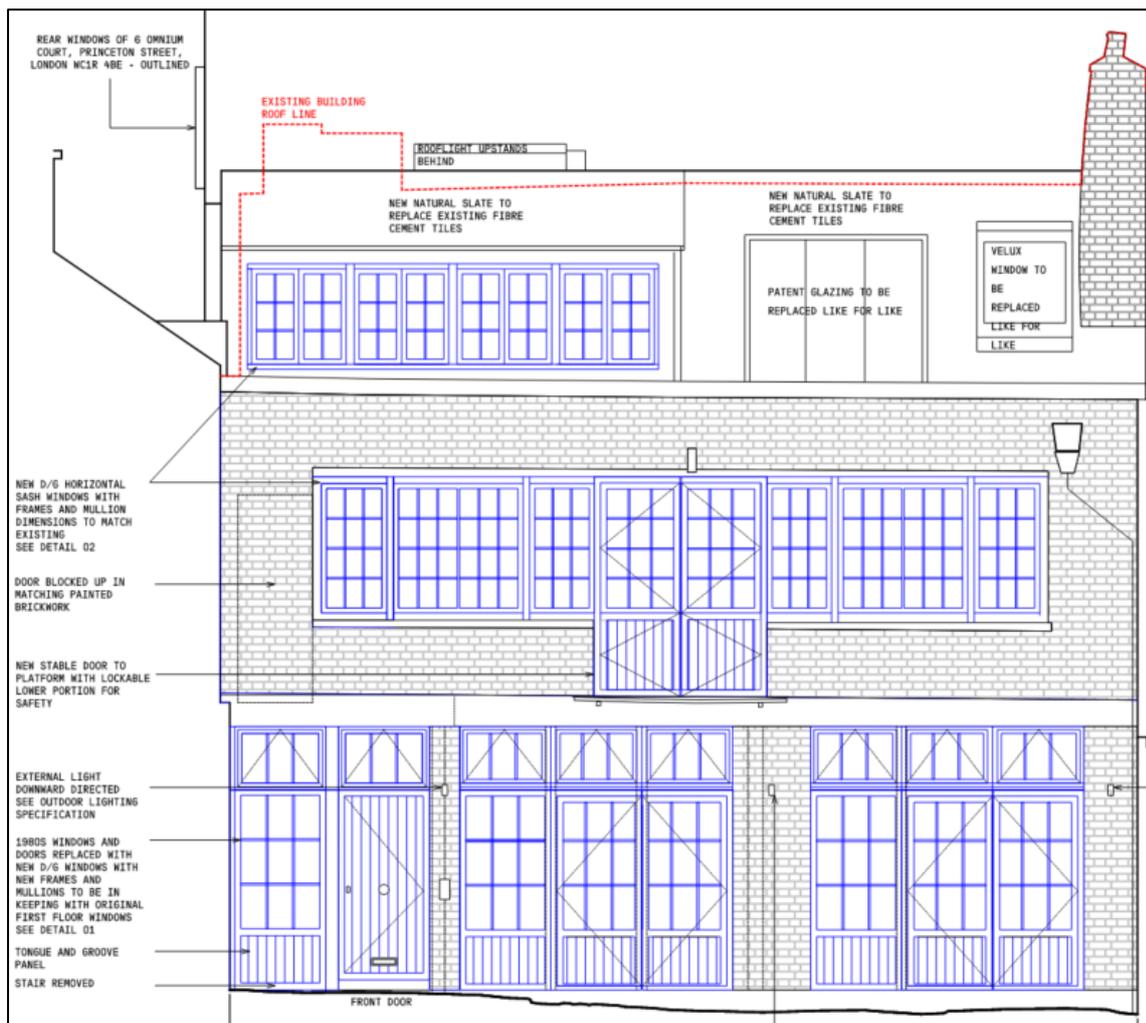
As-built front elevation. Outline of previous roof level in red, with neighbouring window at Omnum Court identified in top left-hand corner.
